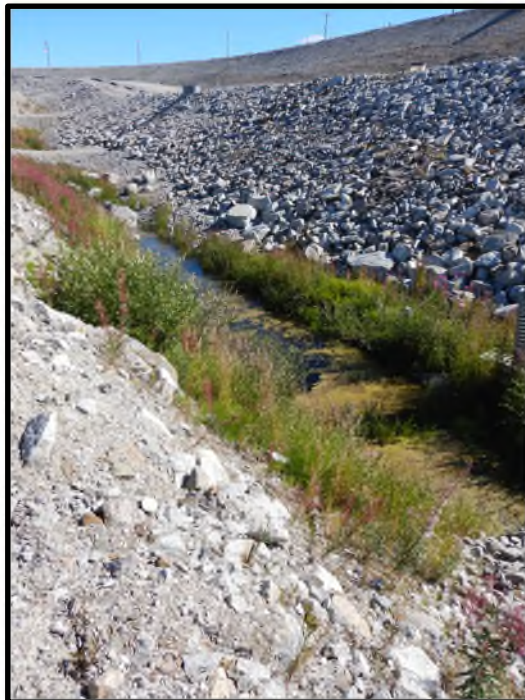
Downstream toe ditch near Station 0+650 showing ponded water along the base of the ditch.
